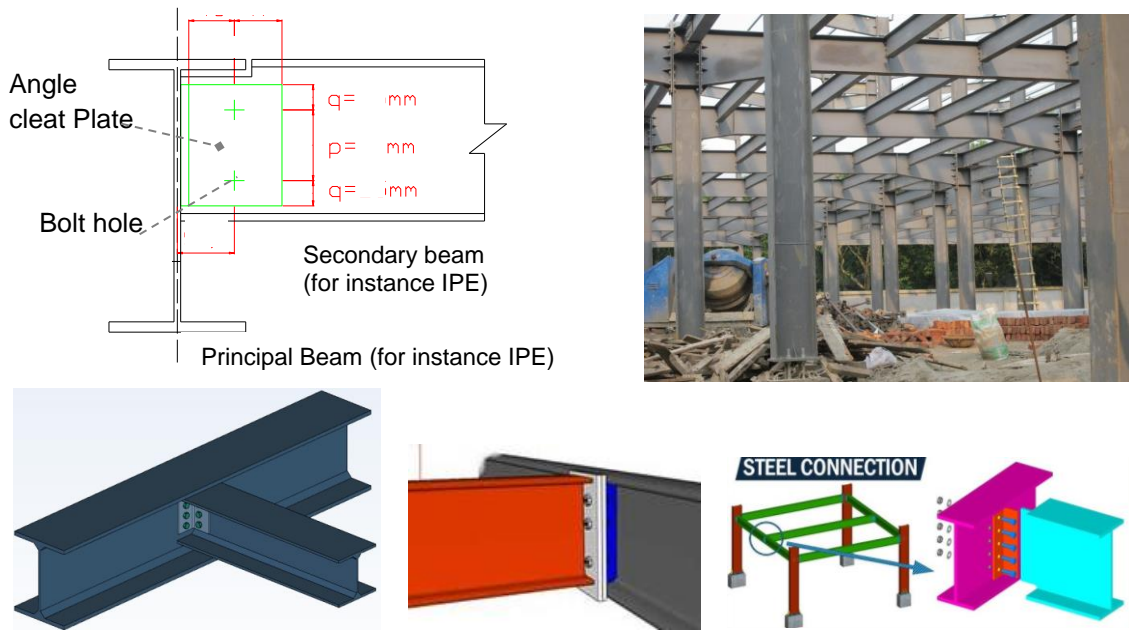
Typical schemes for principal beam - secondary (or auxiliary) beam joints
